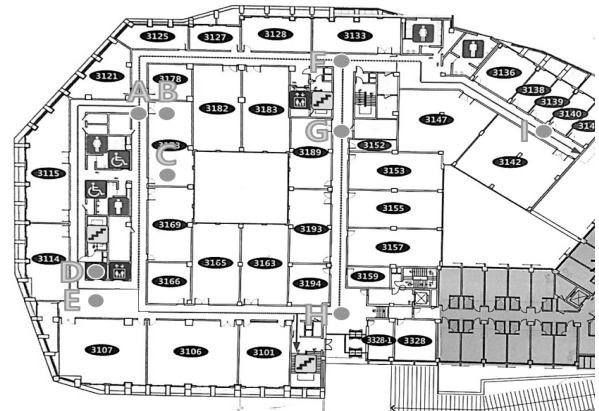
The Floor Plan of the Experimental Building and Each Experimental Point
